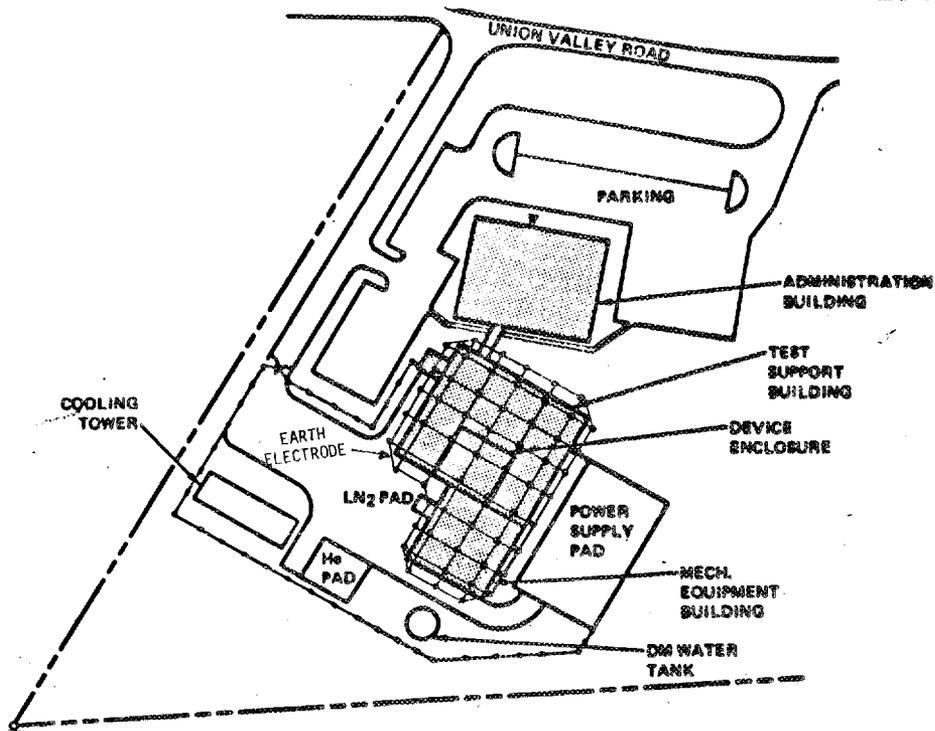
TEST SUPPORT BUILDING EARTH ELECTRODE
